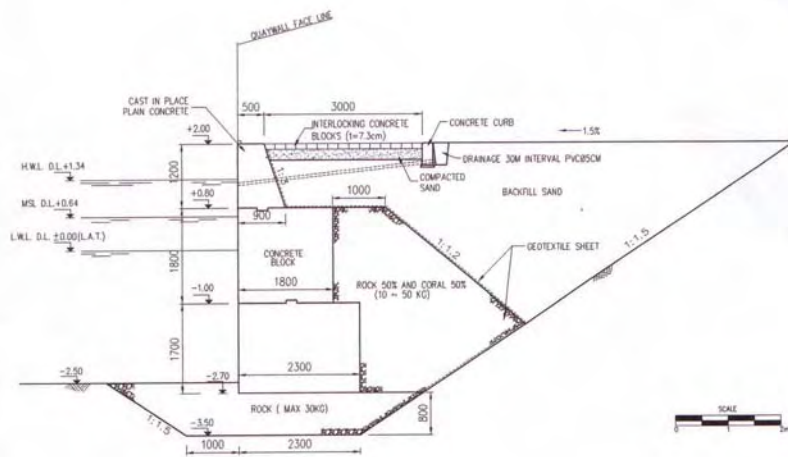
Concrete Block Type Quaywall (Perpendicular Wall)
